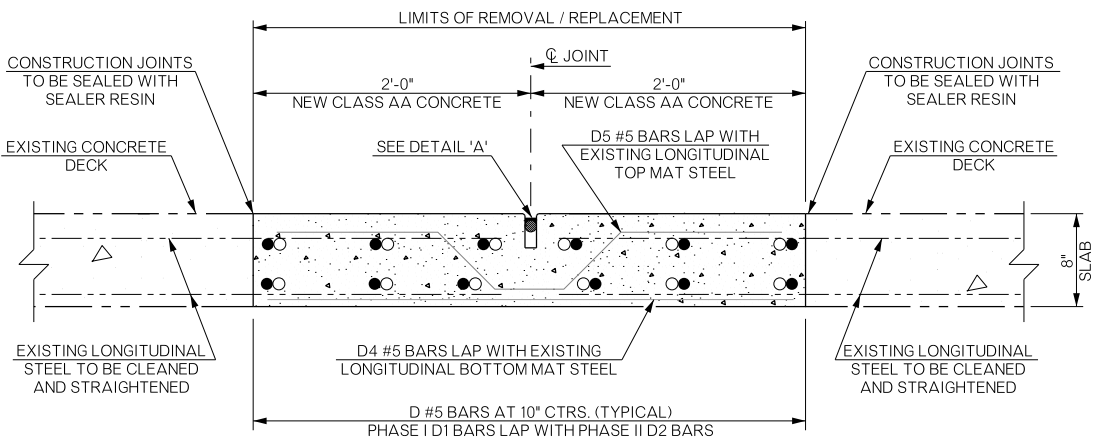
DETAIL OF DECK REMOVAL AT CONSTRUCTION JOINT
